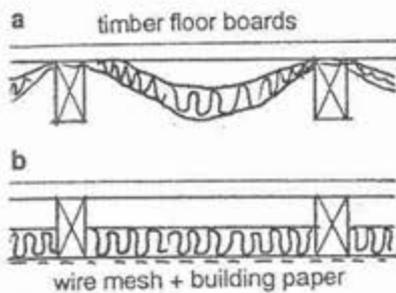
Insulation of exposed timber floor (over open space)
